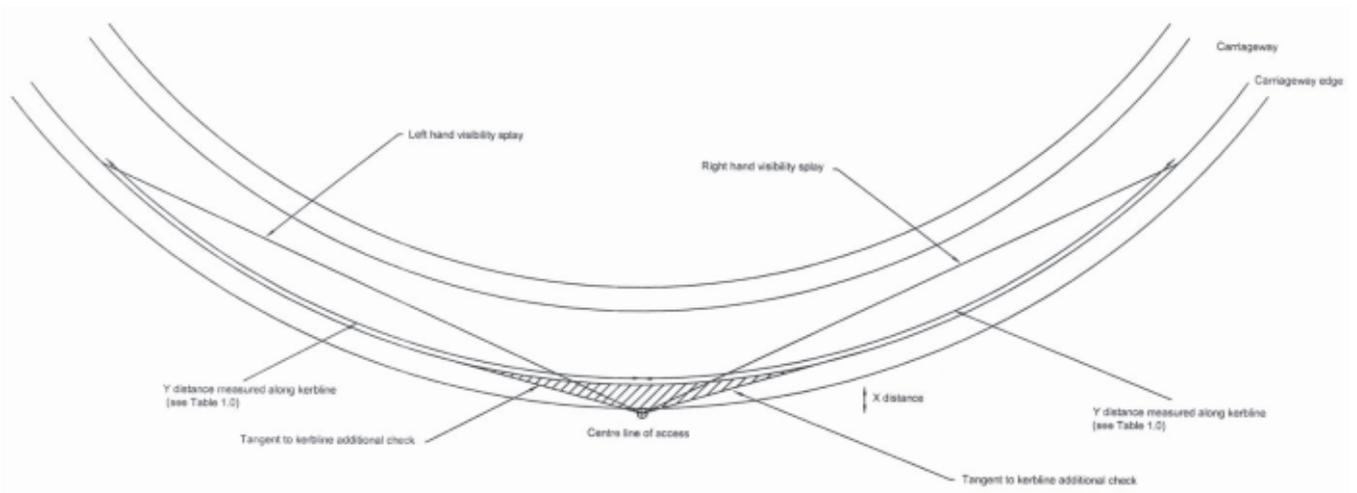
Access visibility splay for traffic exiting development access where access is on the outside of a bend (measured to nearside edge of carriageway).
